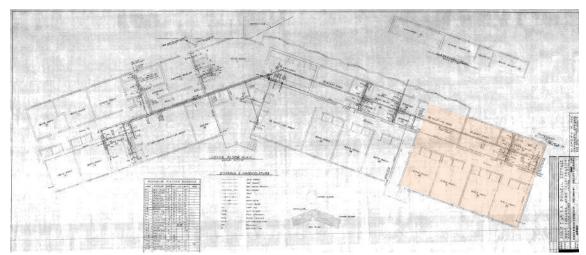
Floor plan of Building 6. Girls' portion of the south wing is shaded in orange. Source: Lower Floor Plan, "Annie E. and E. A. Bushell Cottage, West Oakland Home Corporation," Gerald M. McCue & Associates, Sheet M2, dated October 28, 1957.
